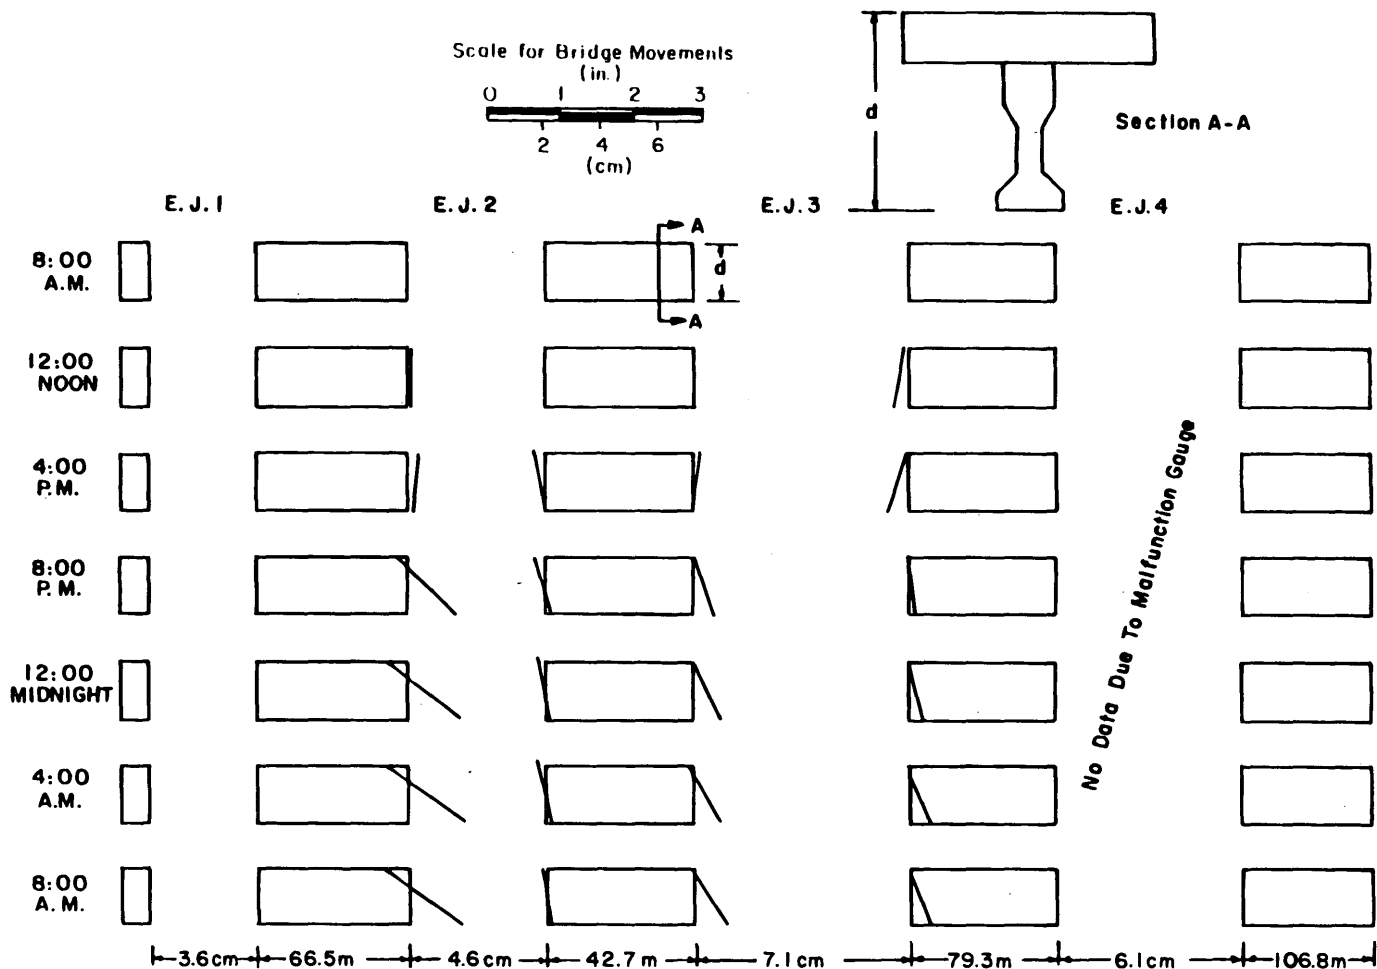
Elevation of south side girders showing 24-hr movements with respect to cap for October 22, 1987. (Note: Longitudinal dimensions of girders and joint spacings are not to scale, but actual end movements are to the scale indicated.)
